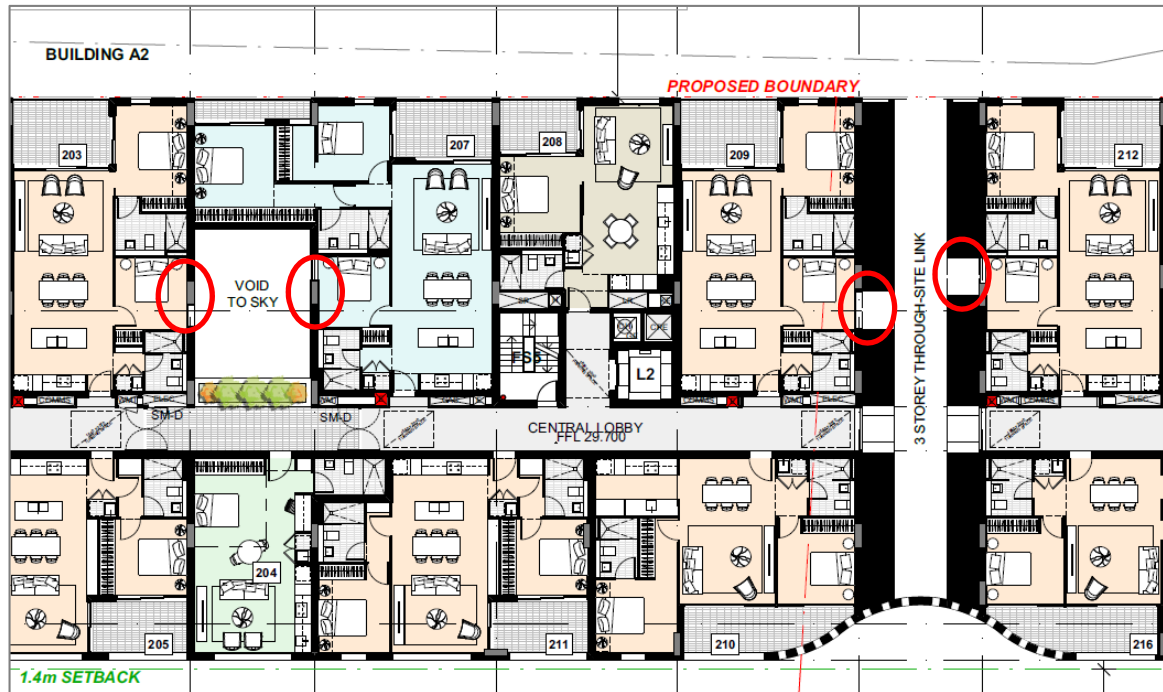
Part Level 2 plan of original Building A (prior to amendments) – bedroom to lightwells and through site link circled
